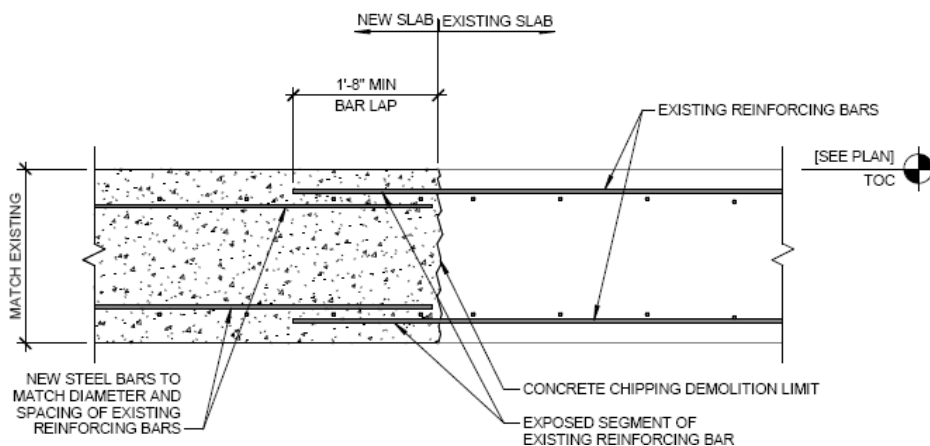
Typical New to Existing Slab at Bathroom | Drawing SF 503
